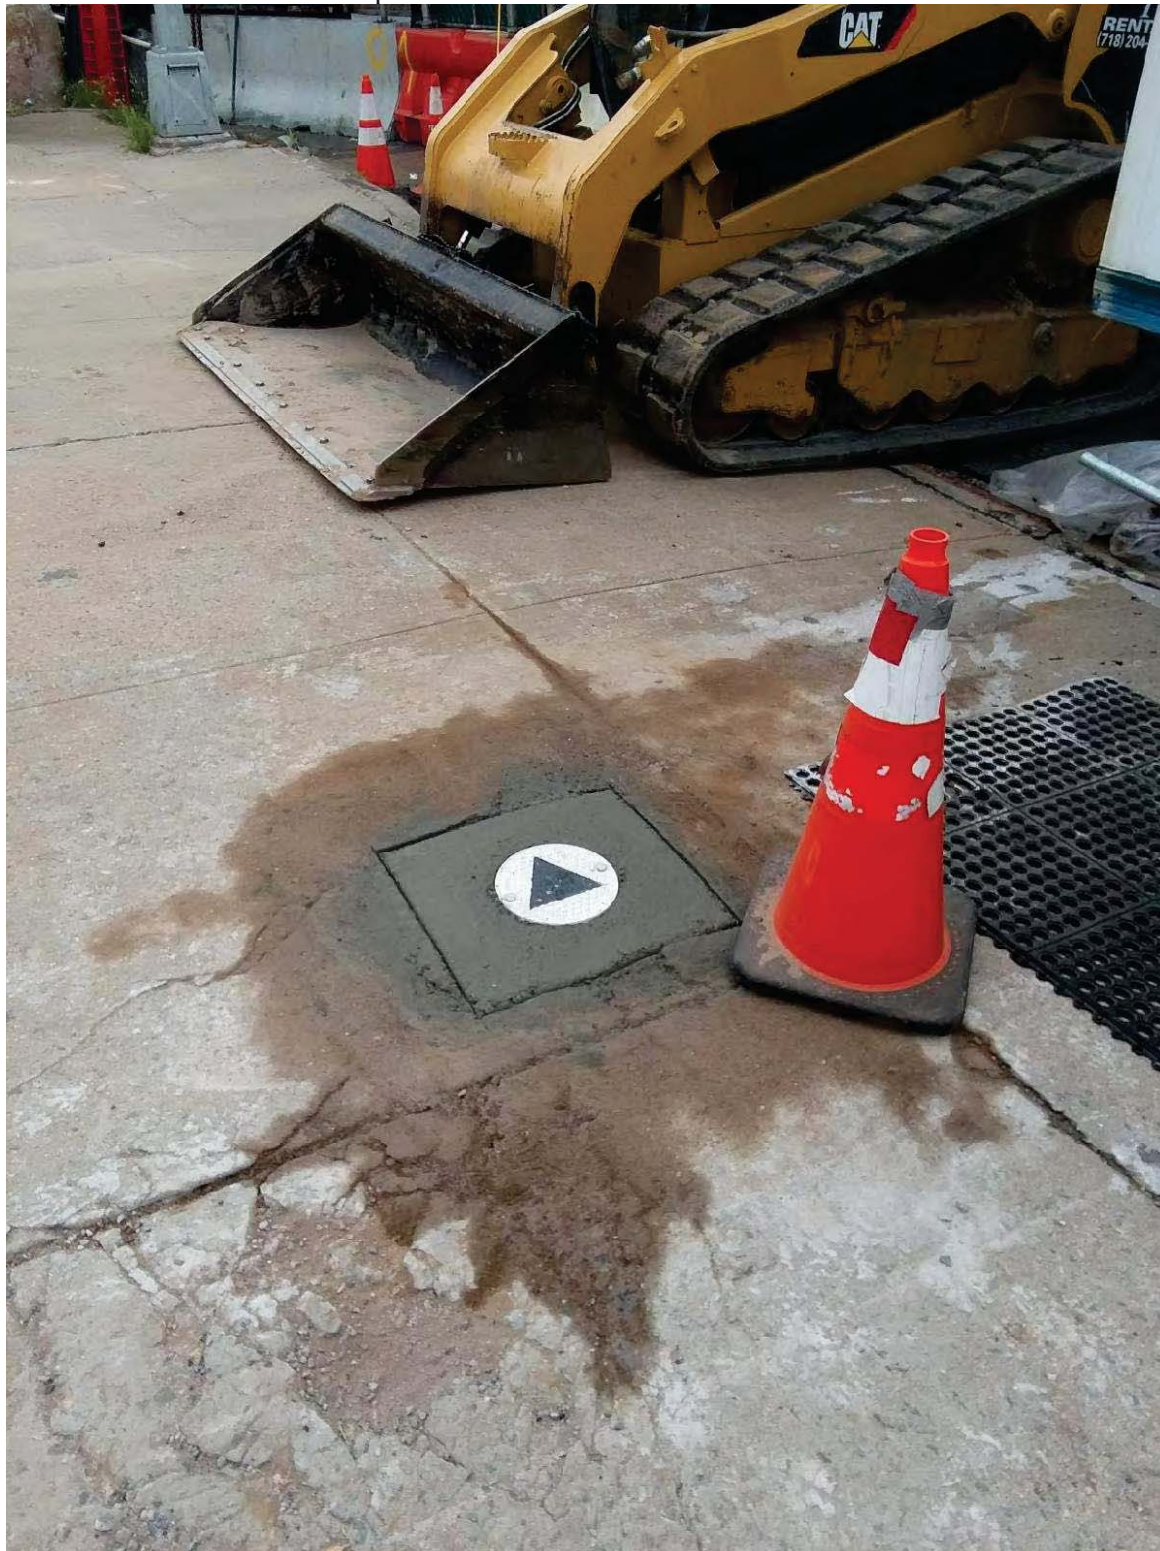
MW-02 damaged manhole removed and well casing cut down
